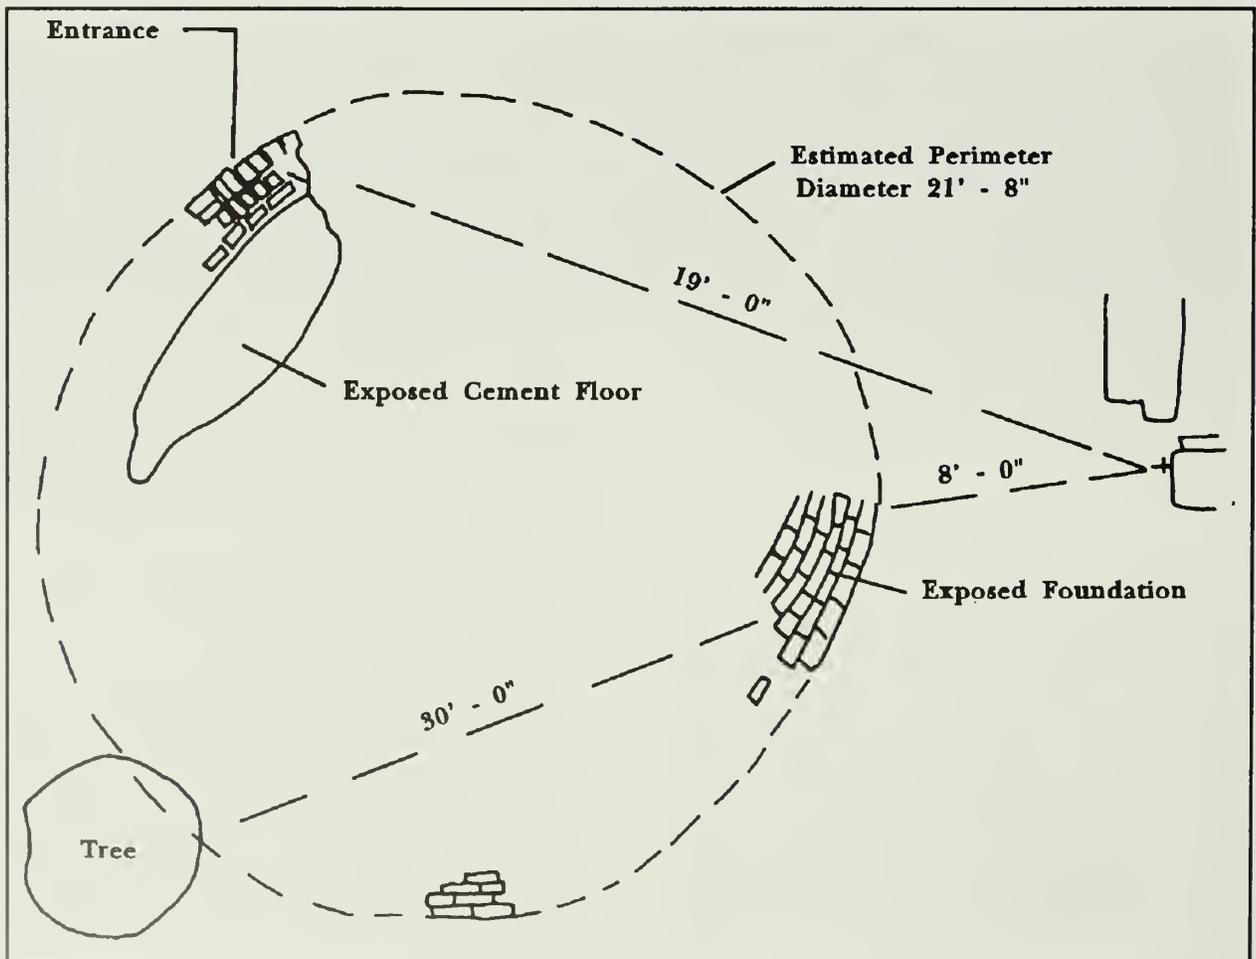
Drawing of 1825 Garden Key Lighthouse foundations in Fort Jefferson parade grounds. Drawing by James Delgado.
